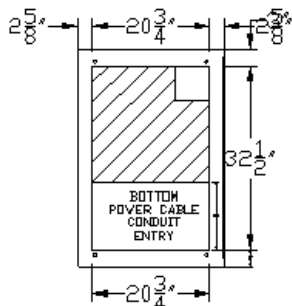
Ultra Compact Front Access Switchgear Single Section Dimensions (rear access is not required)
